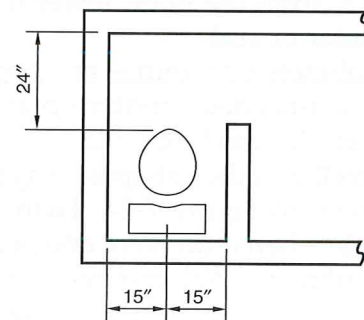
This is the minimum clearance for water closet installation. More space is required to be wheelchair accessible.
